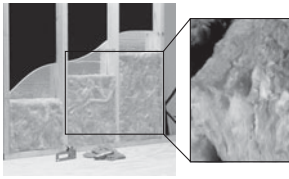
End view of a slab of fiberglass insulation (Passage Problems 78–81).
